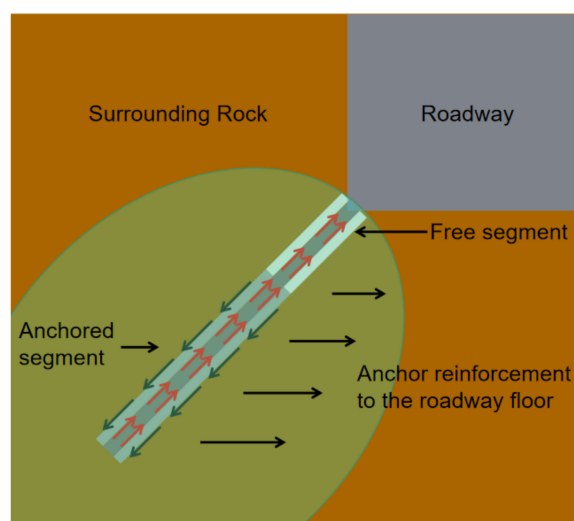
Schematic diagram of bolt reinforcement of the roadway floor by the base-angle bolt.
